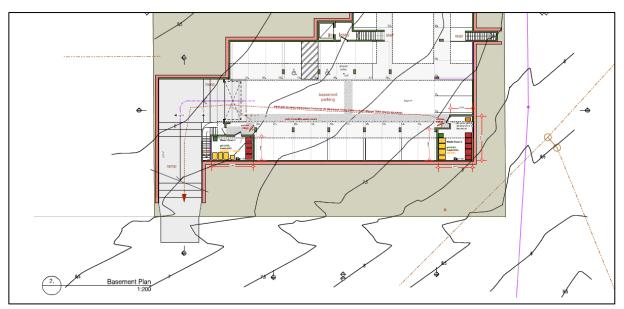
Amended Basement Floor Plan including Waste Storage areas, resident travel paths and convex safety mirrors
